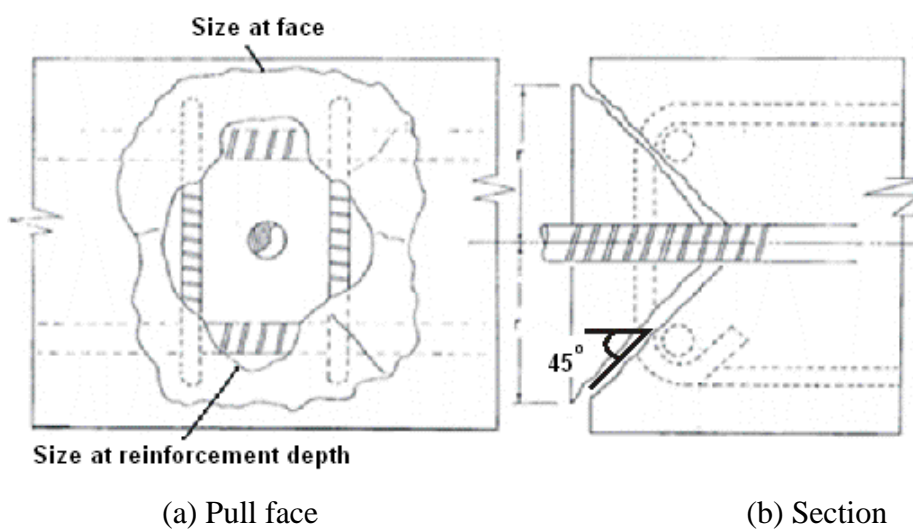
Geometry of typical cone pullout failure. Adapted from Viwathanatepa et al (1979)
